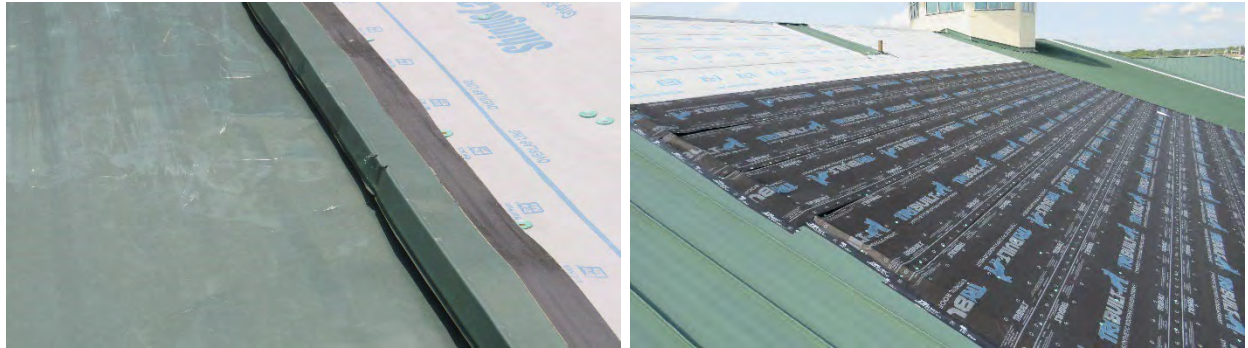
Roofing on the shrewmaker center for workforce tech (12) with no wind damage.
